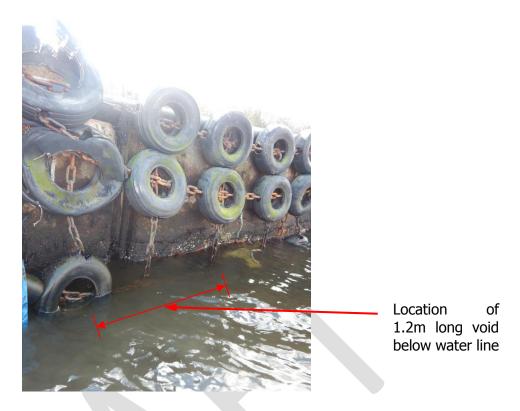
Showing berthing face and fender arrangement with missing tyres along bottom chain
